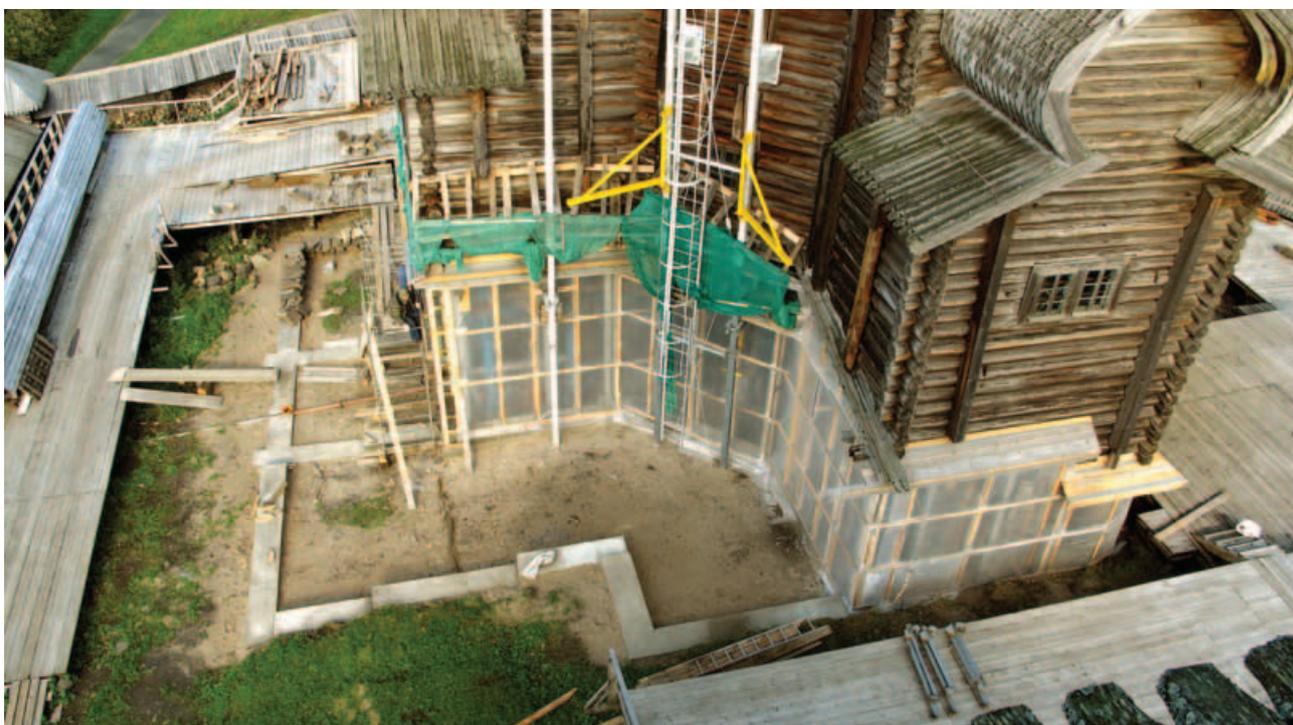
Monument conservation for winter. Top view on the underground foundation part.
